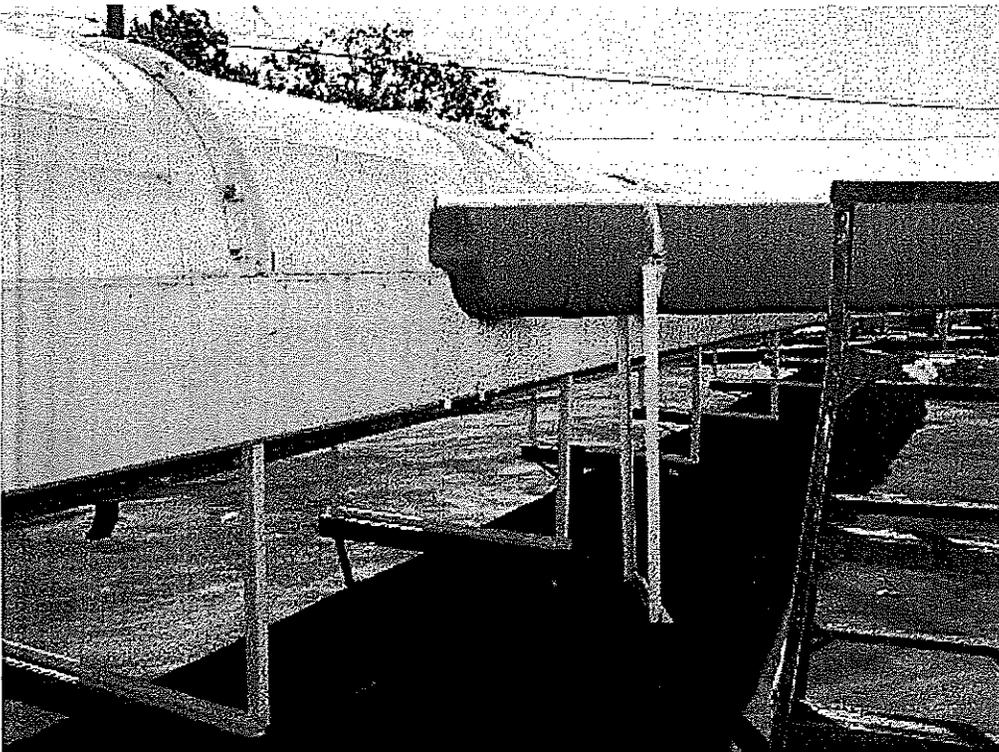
(Photo 2) : Looking south at ductwork leading away from scrubber No. 4.
